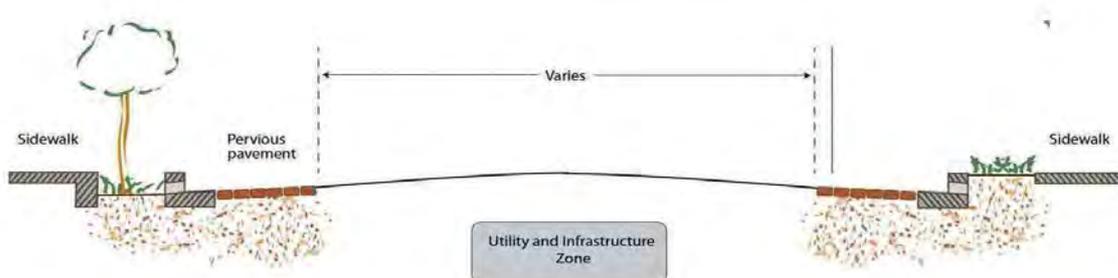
Possible pervious pavement design layout (*Model for Living Streets Design Manual, 2011*).
